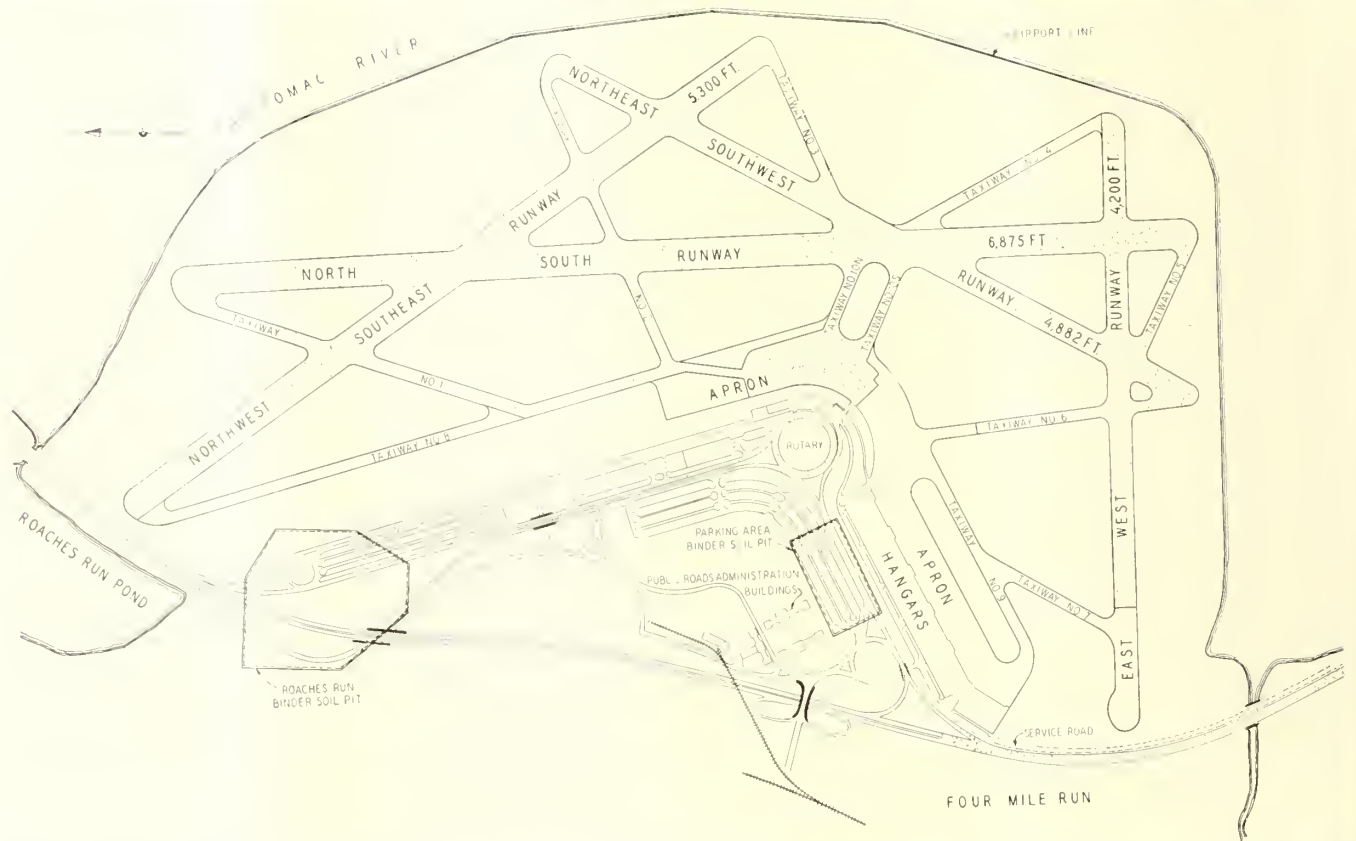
LAYOUT OF RUNWAYS, TAXIWAYS, APRONS, AND ROADS AT THE WASHINGTON NATIONAL AIRPORT. SHADED AREAS INDICATE WORK COMPLETED DURING 1940
